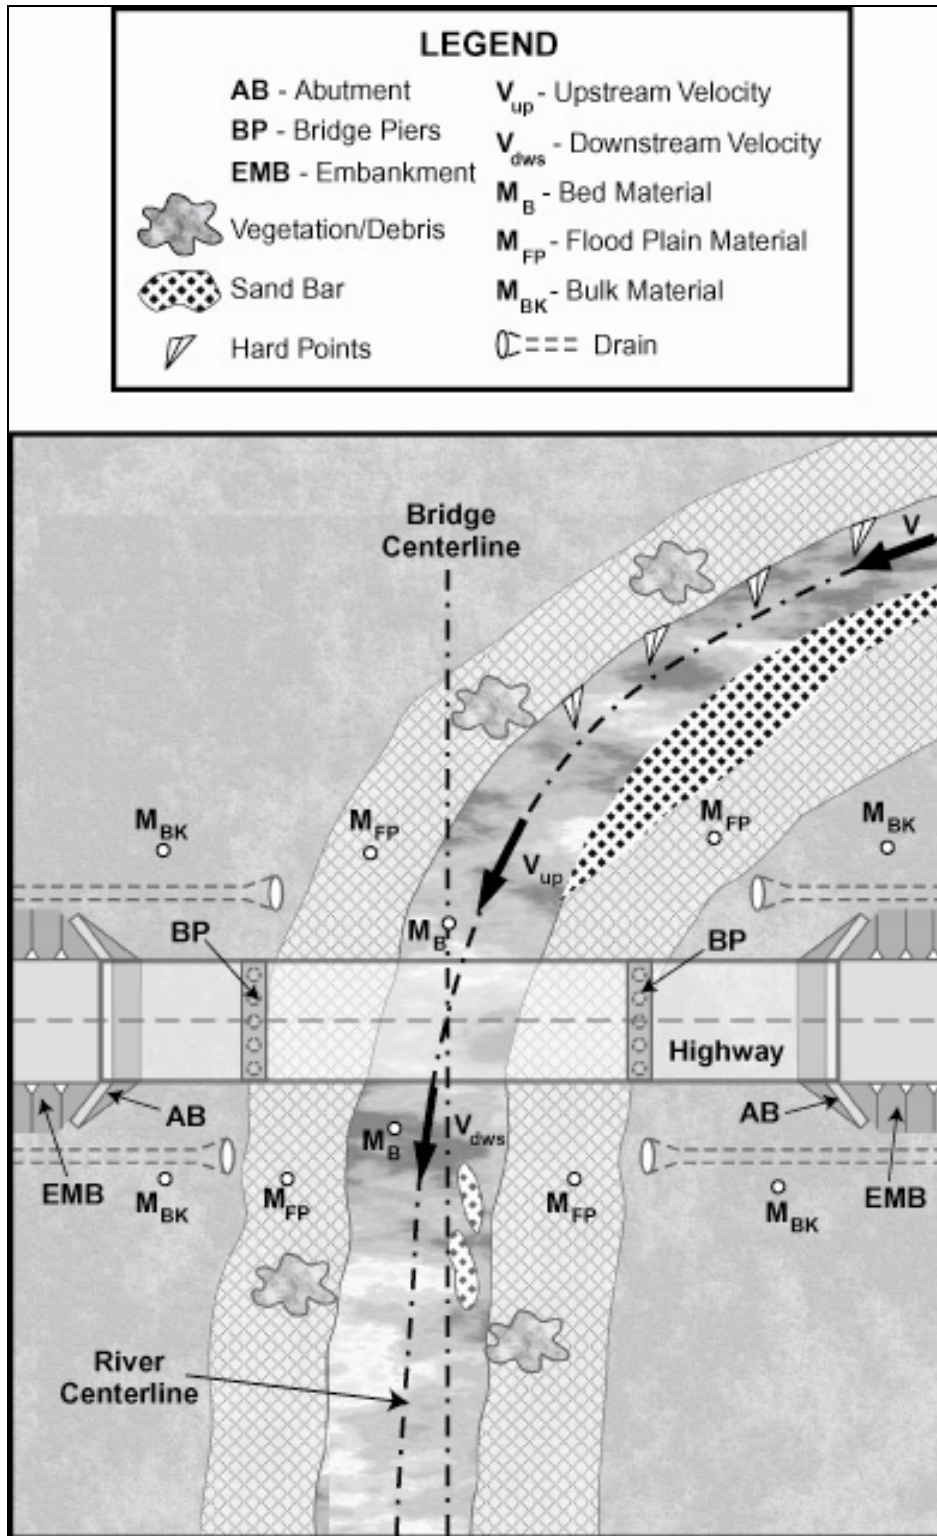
Plan-view sketch detailing bridge components and surrounding features of a bridge waterway
